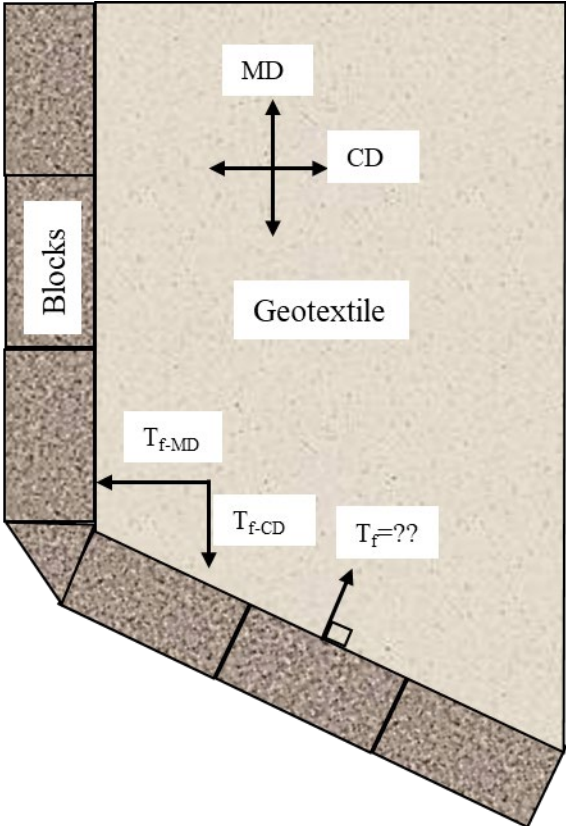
Illustration of the facing walls meeting at angle greater than 90 degrees.
